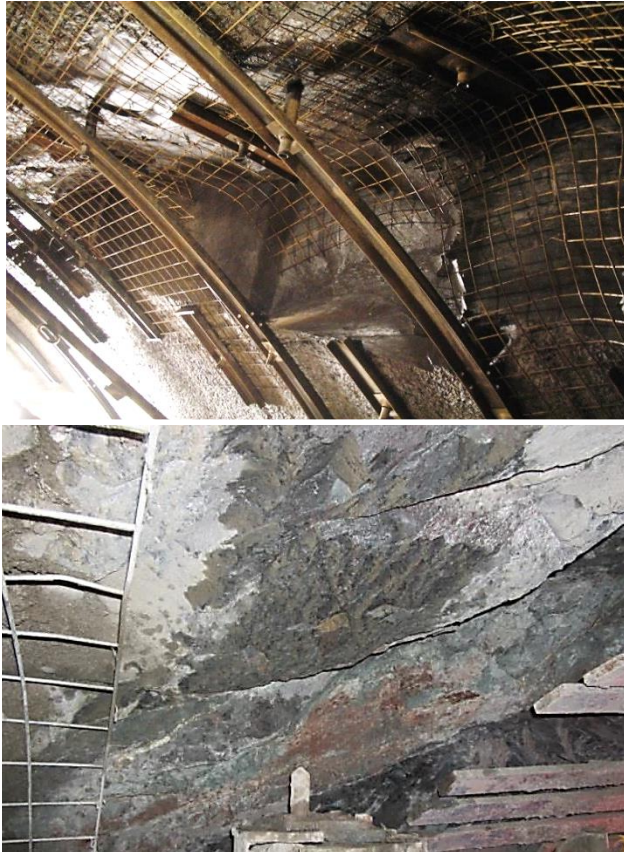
Examples of (top) corner failure in a TBM tunnel and (bottom) roof instability an overbreak (also TBM in this case) due to shallow dipping bedding structures.
